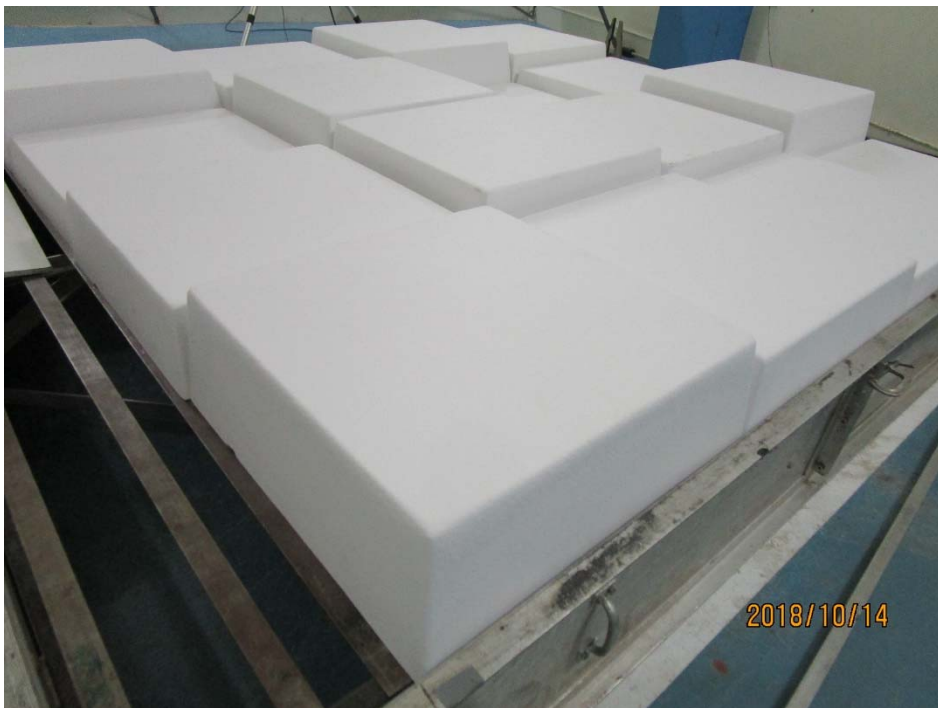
Specimen prior to application of perimeter seal, as viewed from northwest corner
